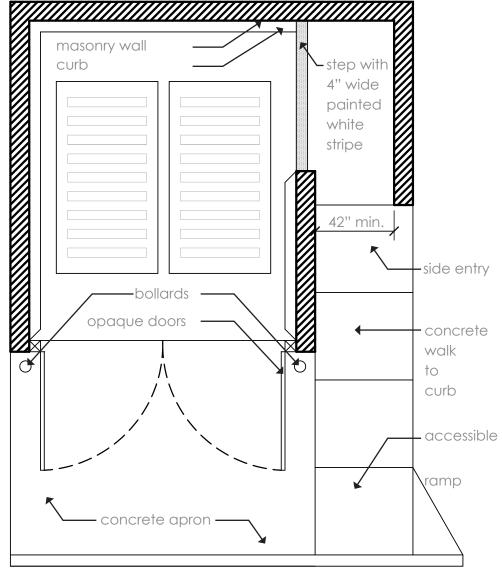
TRASH ENCLOSURE EXAMPLE PLAN
